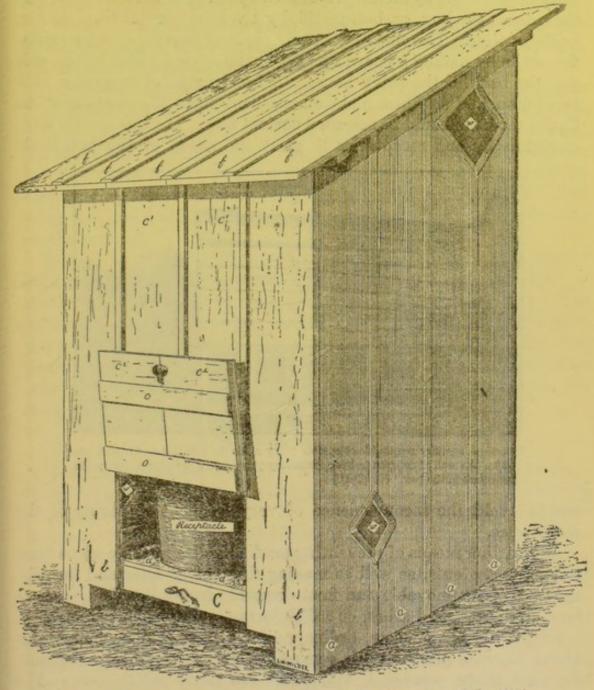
Rear and side view of a removable-receptacle sanitary privy. (Stiles, 1910.)
